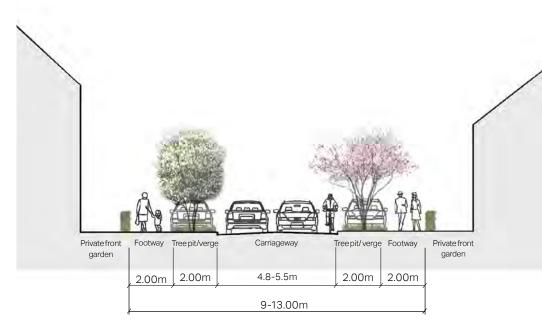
Cross-section to illustrate some guidelines for residential streets 2.
